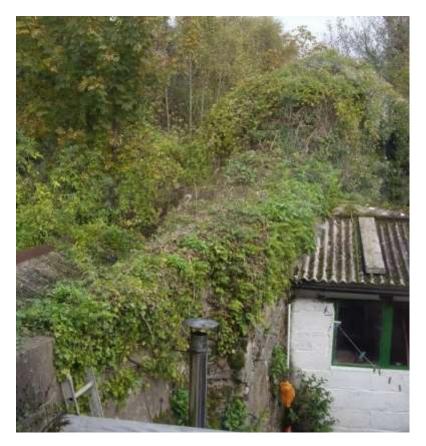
Detail showing lower and narrower section of the Town Wall between no 12 and 13/15 New Street.
